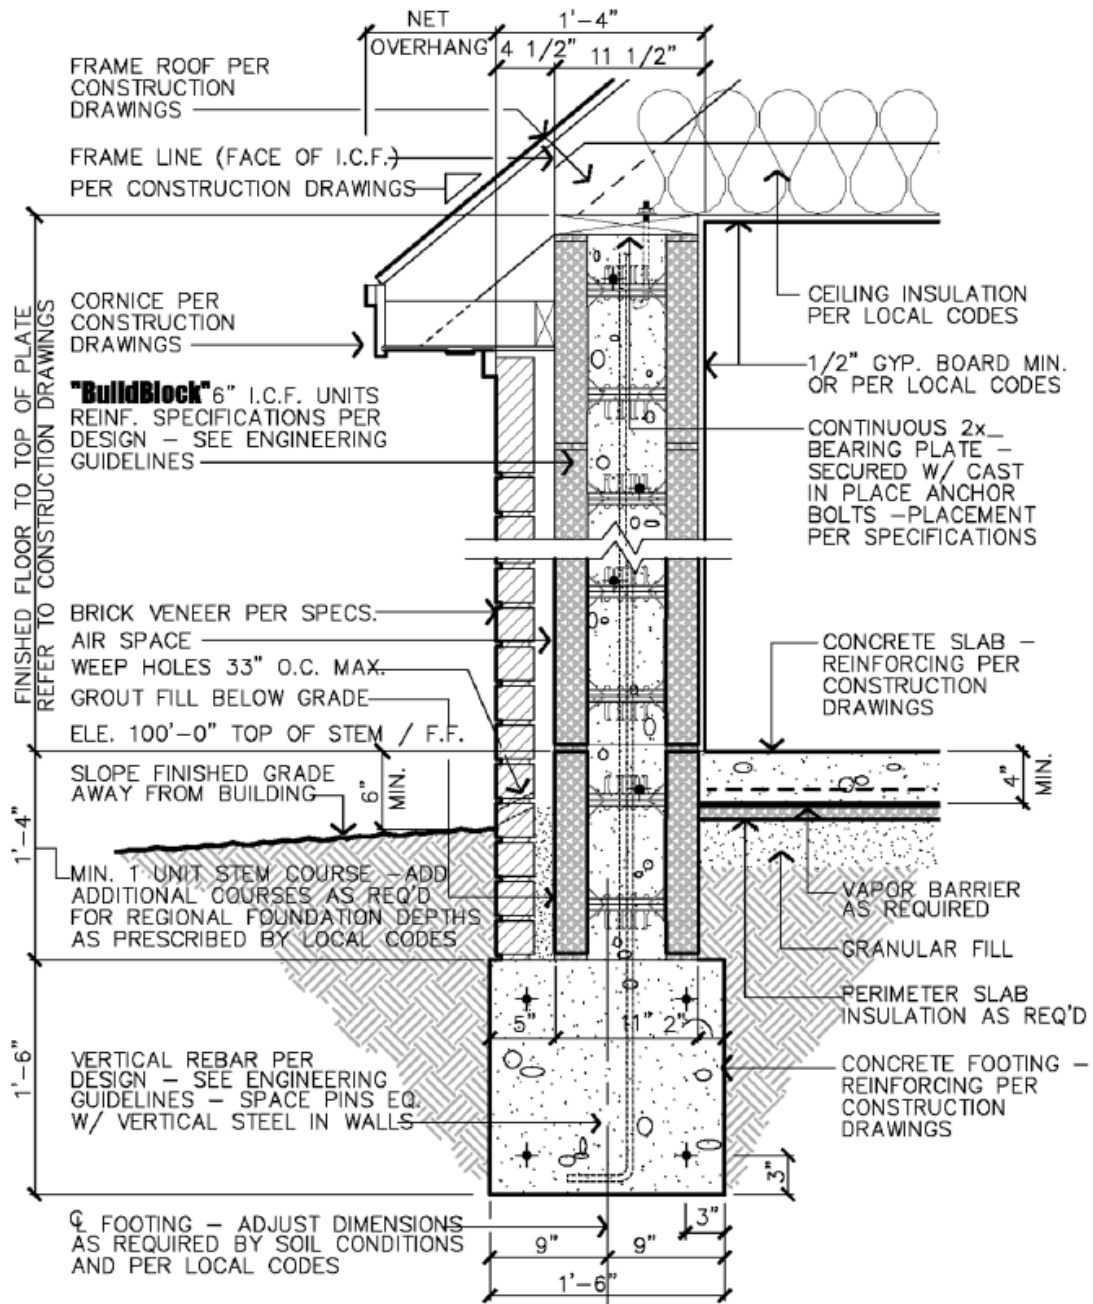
BUILDBLOCK® AND BUILDLOCK® SINGLE STORY WALL DETAIL (TYPICAL)
